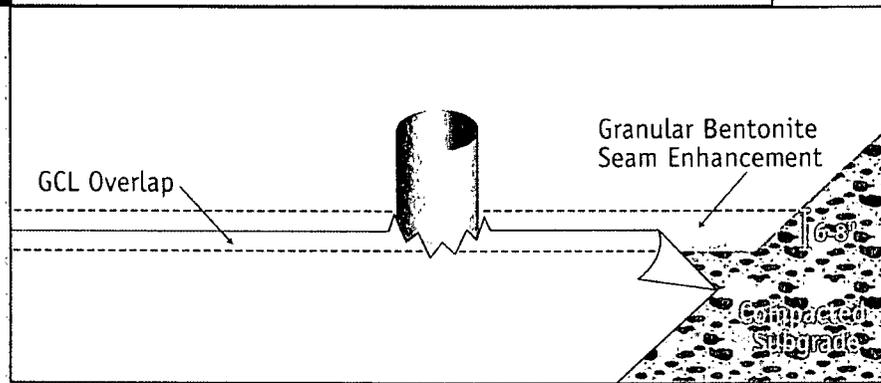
CROSS-SECTION OF GCL SEAL AGAINST AN EMBEDDED STRUCTURE OR WALL
